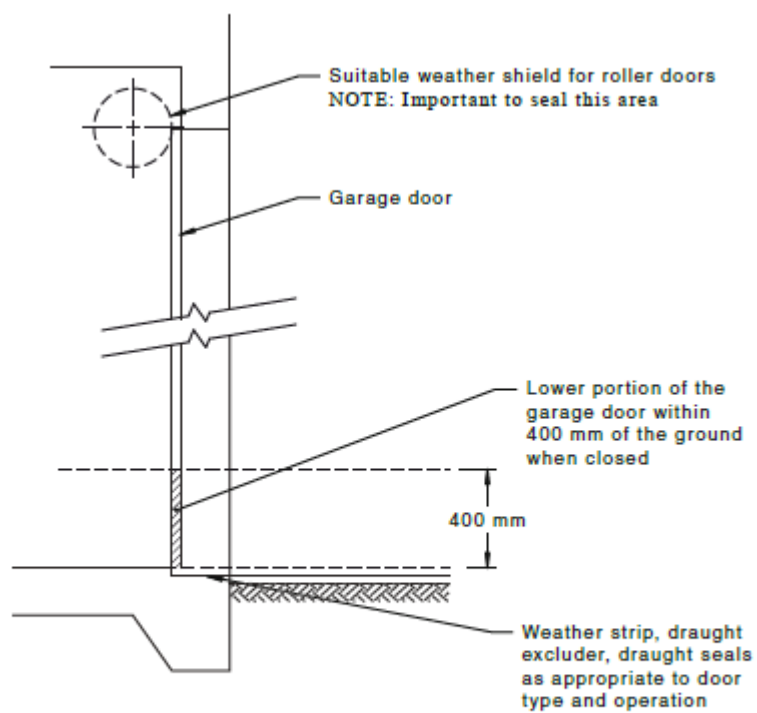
VEHICLE ACCESS DOORS (GARAGE DOORS)
